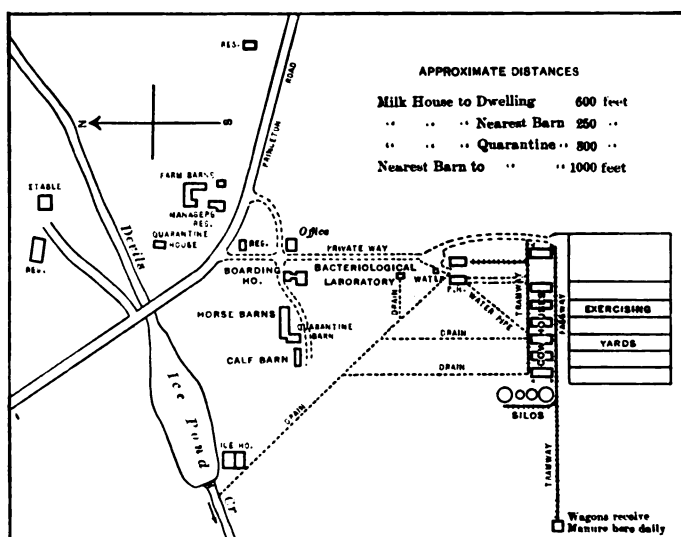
DIMENSION PLAN SHOWING POWER HOUSE AND ARRANGEMENT OF BUILDINGS ON DAIRY FARM AT PLAINSBORO, N. J.
